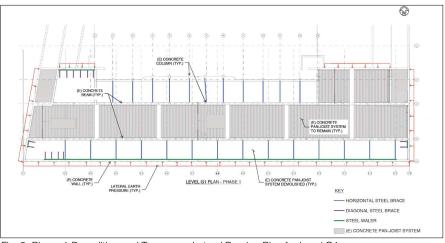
Phase 1 Demolition and Temporary Lateral Bracing Plan for Level G1
